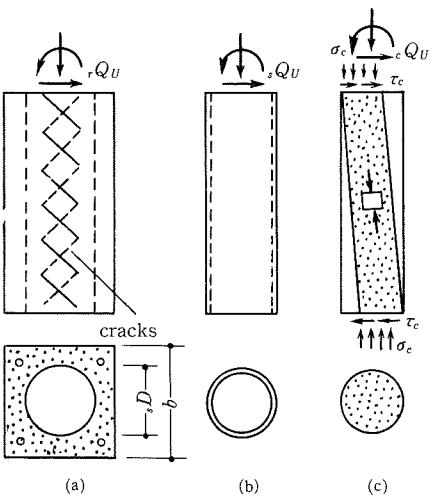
Composite Steel Tube and Concrete Sections Covered by the Standards
